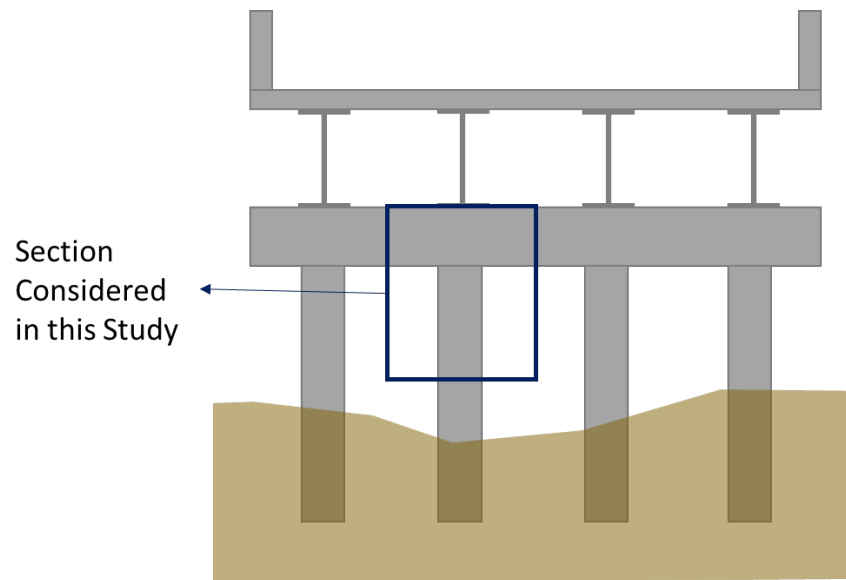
Element connection of pile to bent cap (Adapted from Kappes et al., 2016)
